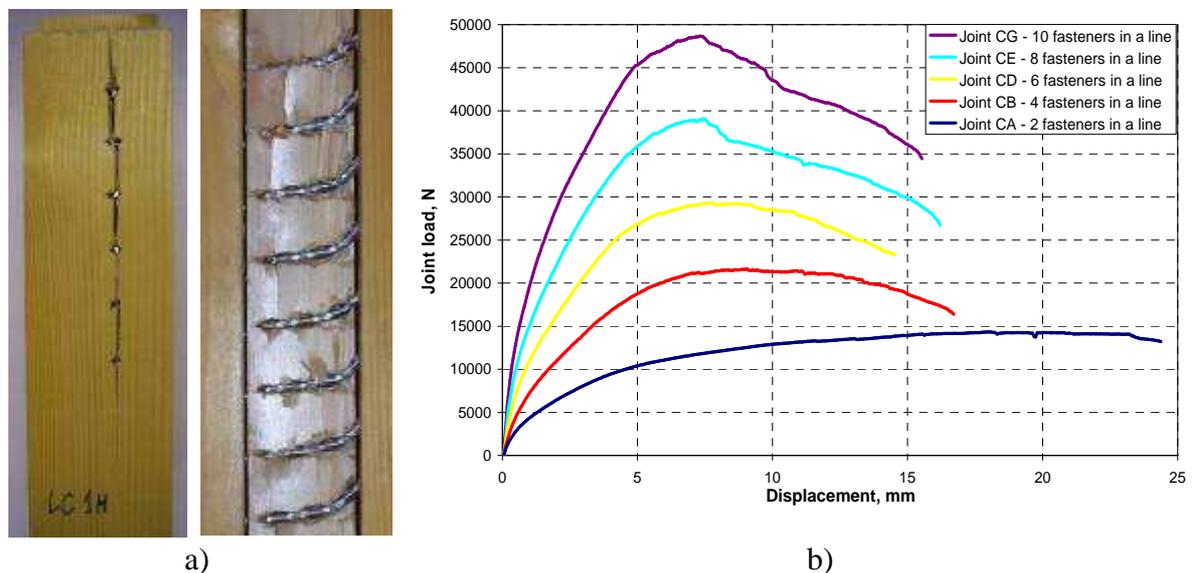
Mode of failure of multiple fastener samples
